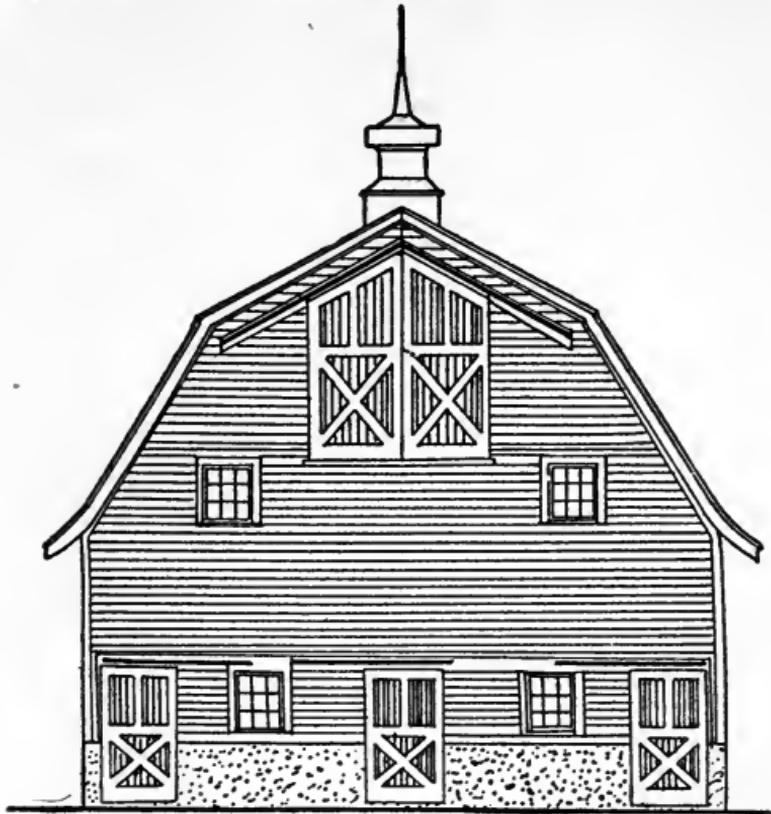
End Elevation of a Typical Curb-Roof Dairy Stable and Storage Barn. The Concrete Foundations Extends $3\frac{1}{2}$ Feet Above Grade
